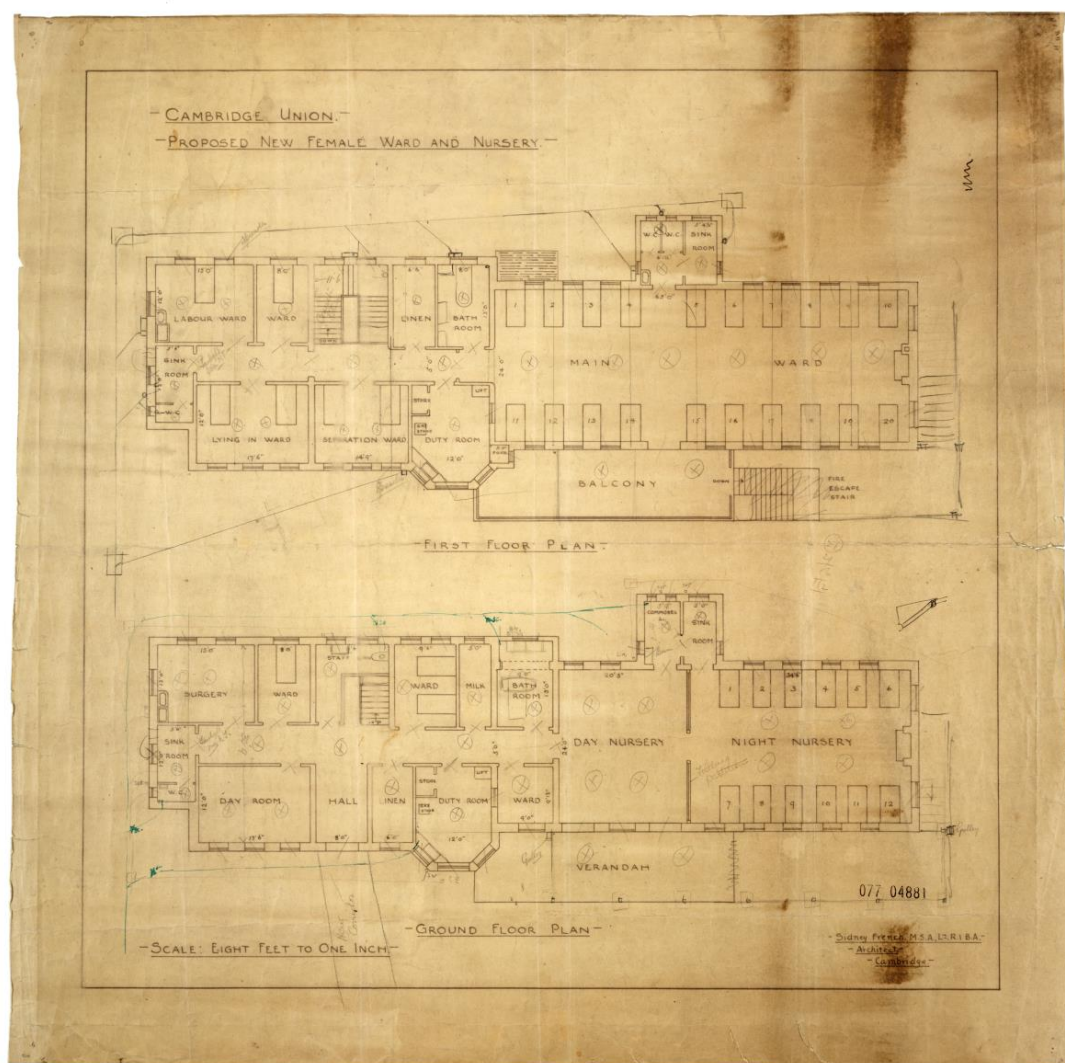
New Female Infirmary: 1926 plans (CA: G/C/AP24)
